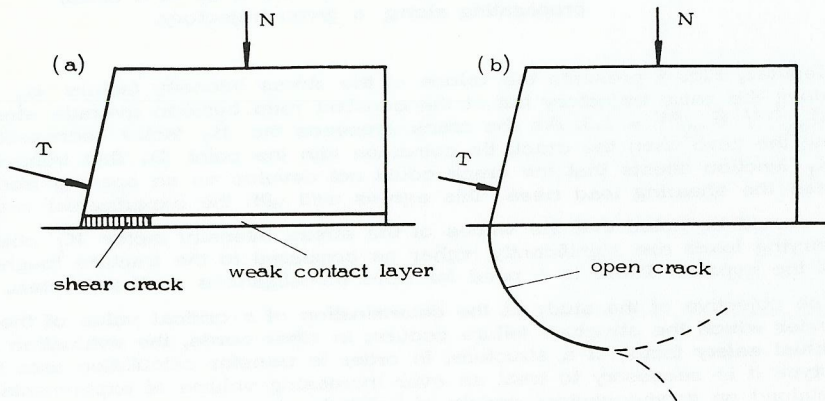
The mode of failure in shear tests of a plate: the development of a shear crack in a weak contact layer (a); the development of an opening mode crack in foundation (b).
